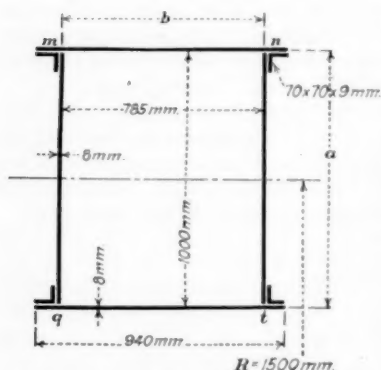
CROSS-SECTION OF FAIRBAIRN CRANE BOX GIRDER
